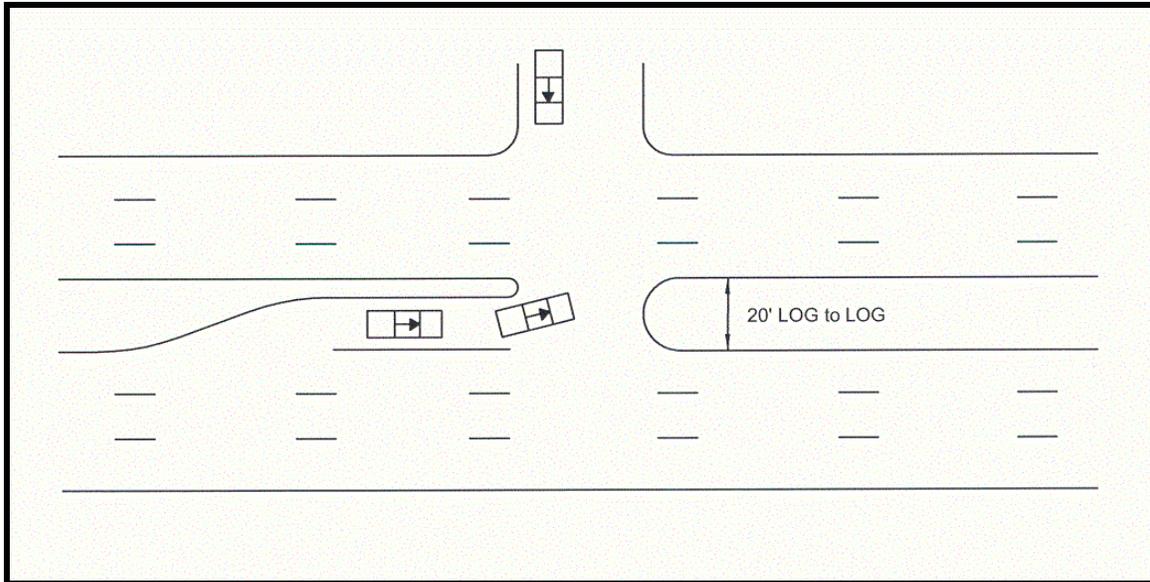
Typical Median Application for Providing Crossing Vehicle Protection from a Driveway or Cross Street
